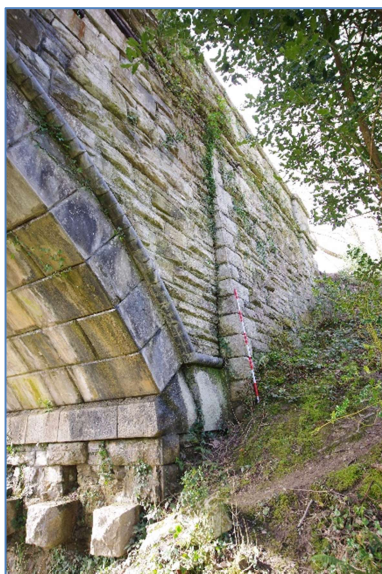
COV39 Cocks Viaduct, west end of north elevation, looking southwest.
